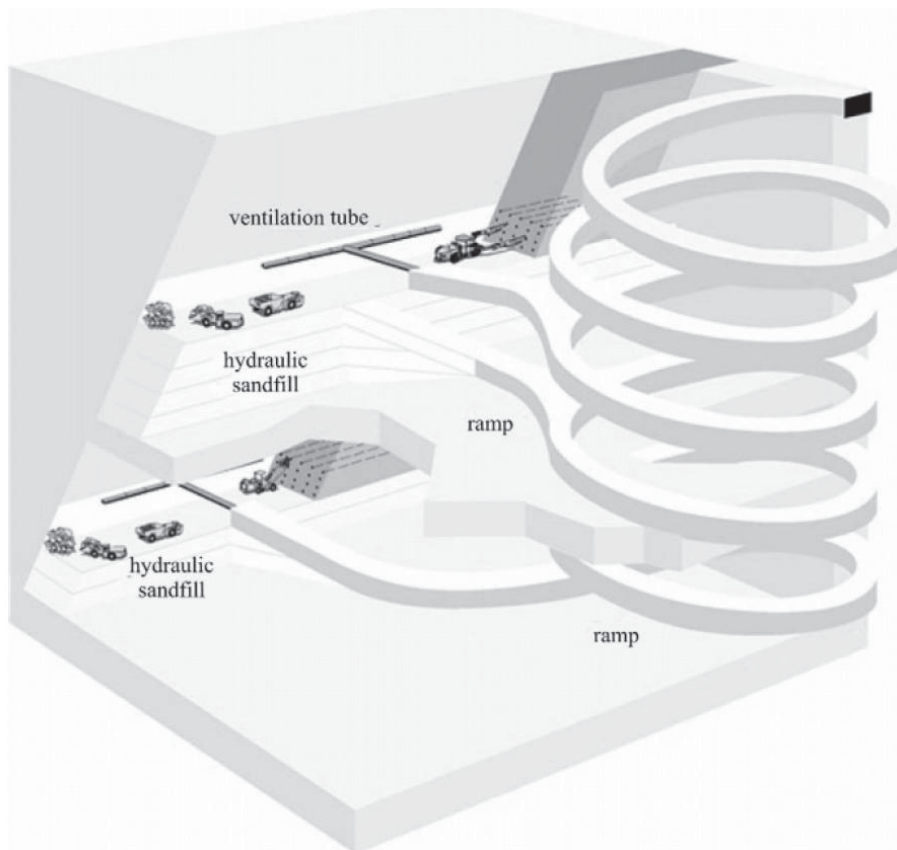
Mechanized Cut and Fill Stoping ¹ p.349
